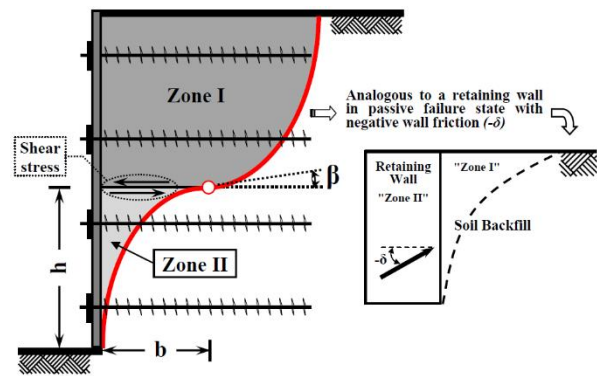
Illustration of failure surfaces and soil zones involved in failure mechanism.
